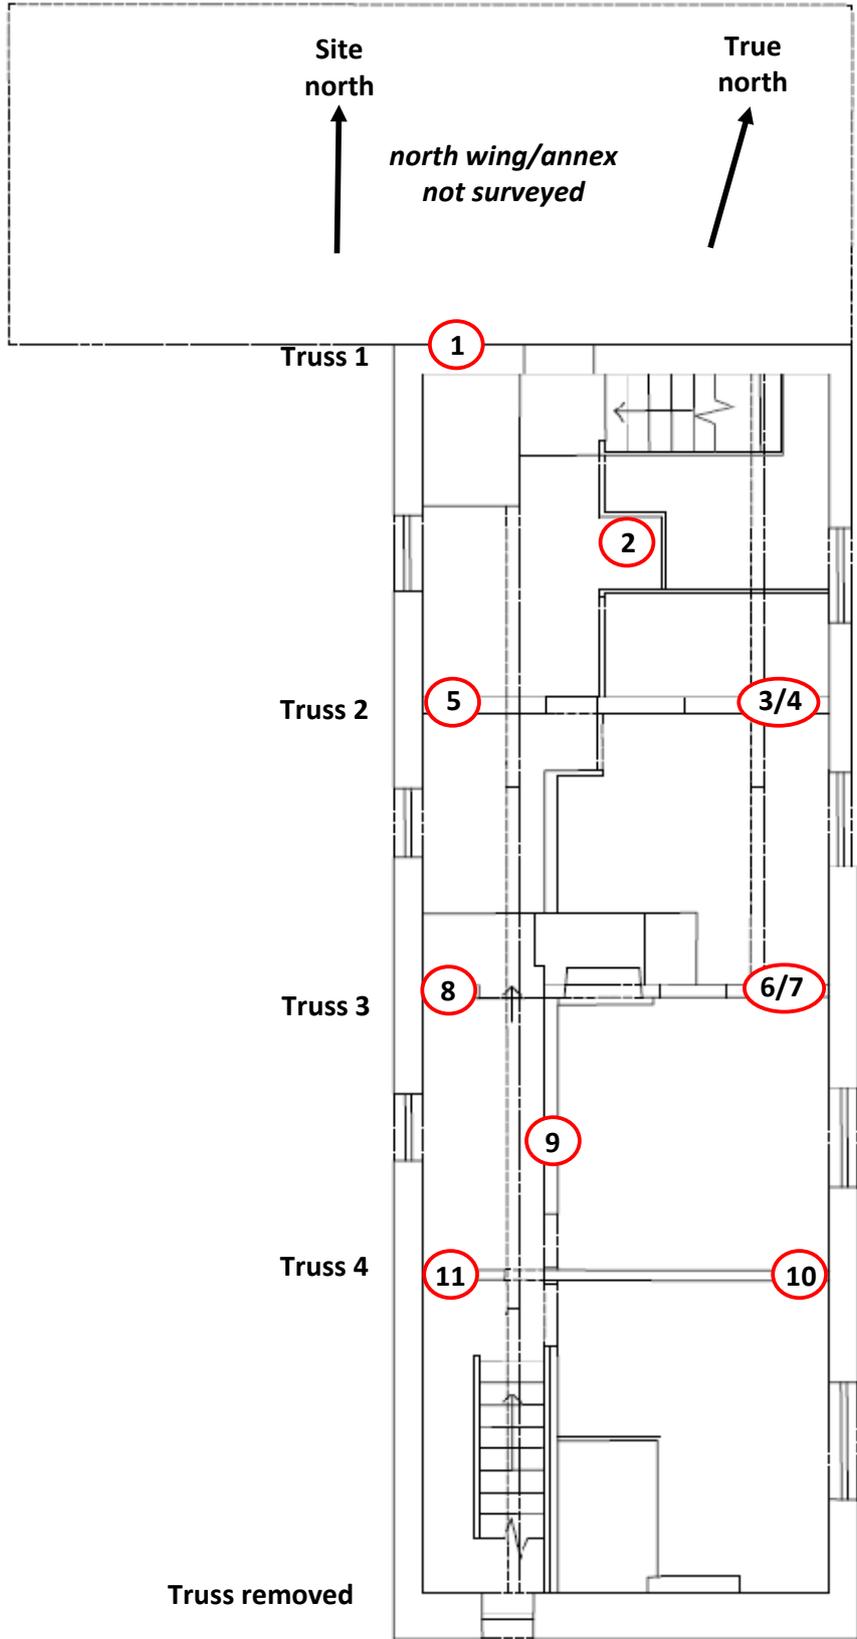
Plan at first-floor level to show the locations of the sampled timbers (after Rebecca Lane 2021)
